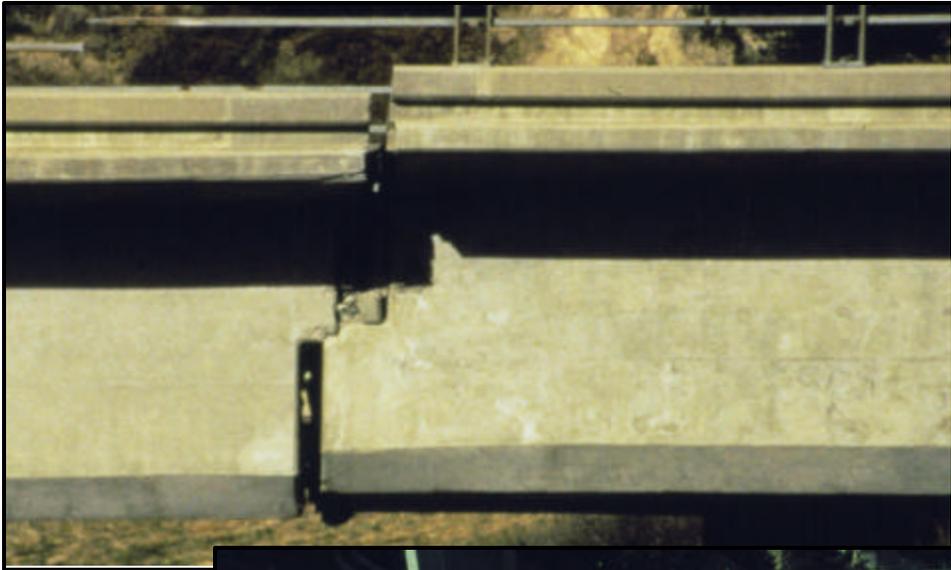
Different views of damage from the damaged bridge (11)
